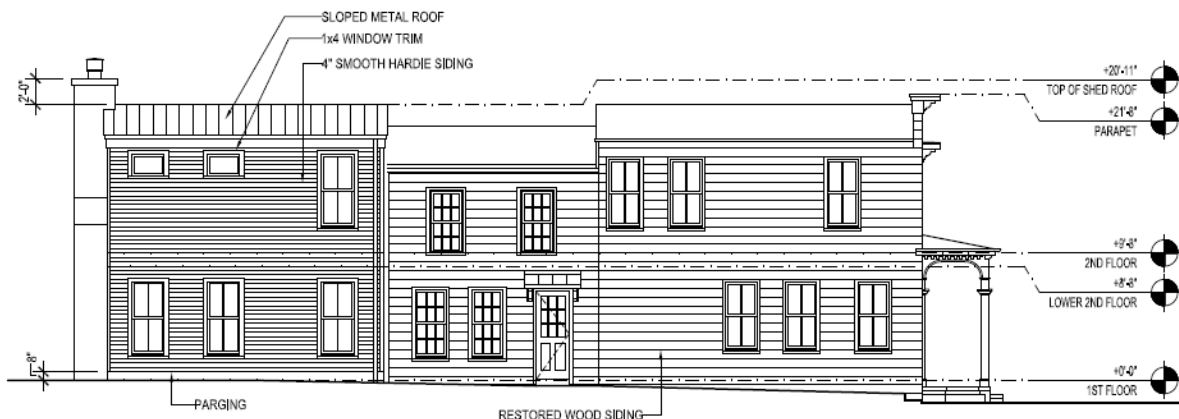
CURRENT SUBMISSION, east (side) elevation.
